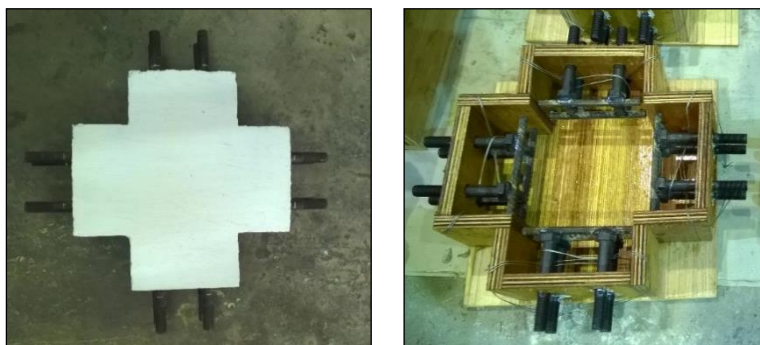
Specimen design in cruciform shape for the biaxial tensile test
